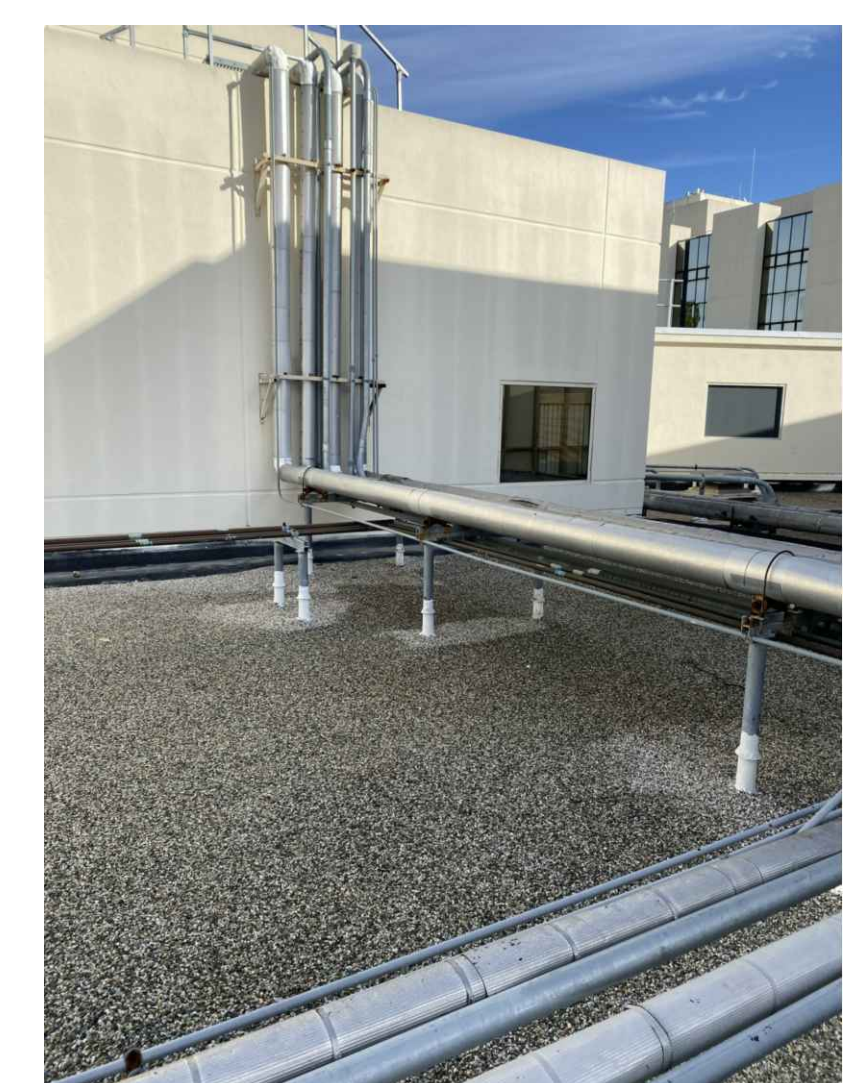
VERTICAL CONDUIT RACK FROM 1ST FLOOR ROOF TO 2ND FLOOR ROOF
